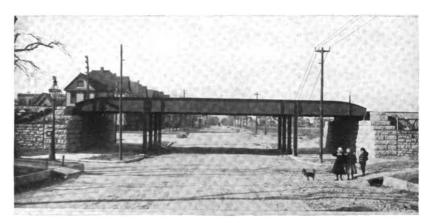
Bridge at Montrose Ave., 80 ft. Between Abutments, Posts on Curb Line.
